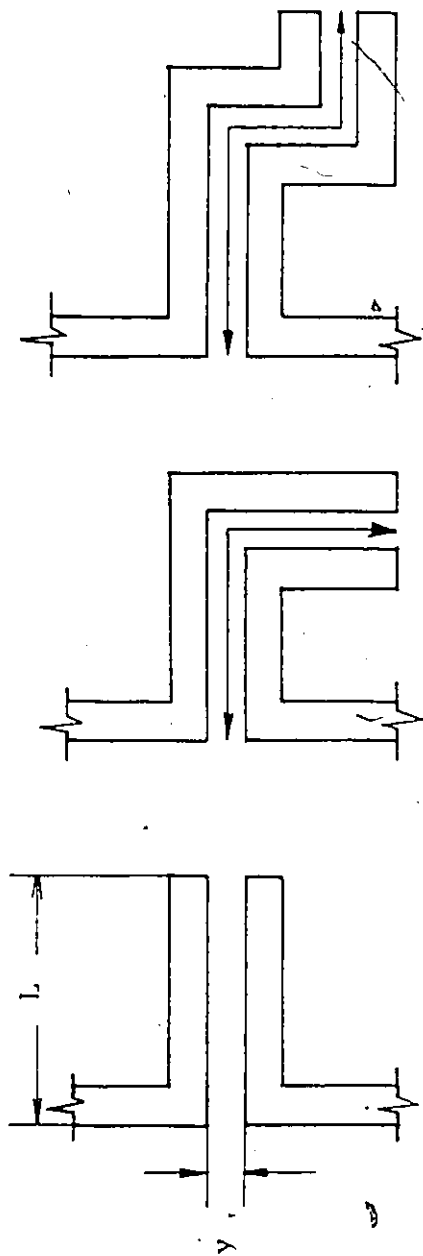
Typical Configurations of Cracks encountered in Buildings
